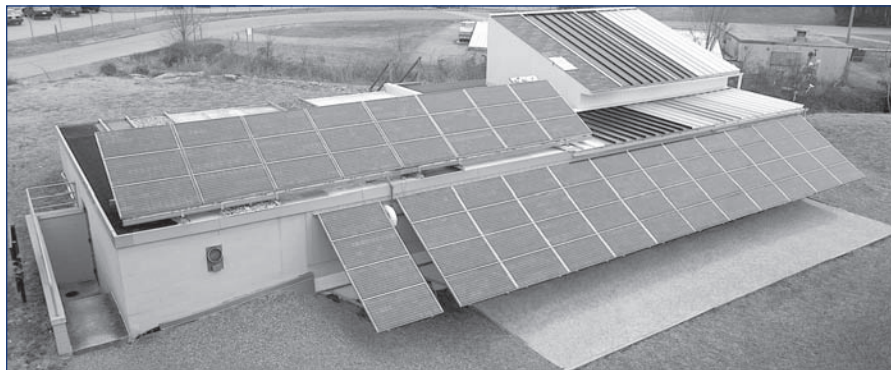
Building-integrated photovoltaic (BIPV)(offset-mounted) installed on the low-slope membrane roof systems and the south-facing wall of the ESRA.
